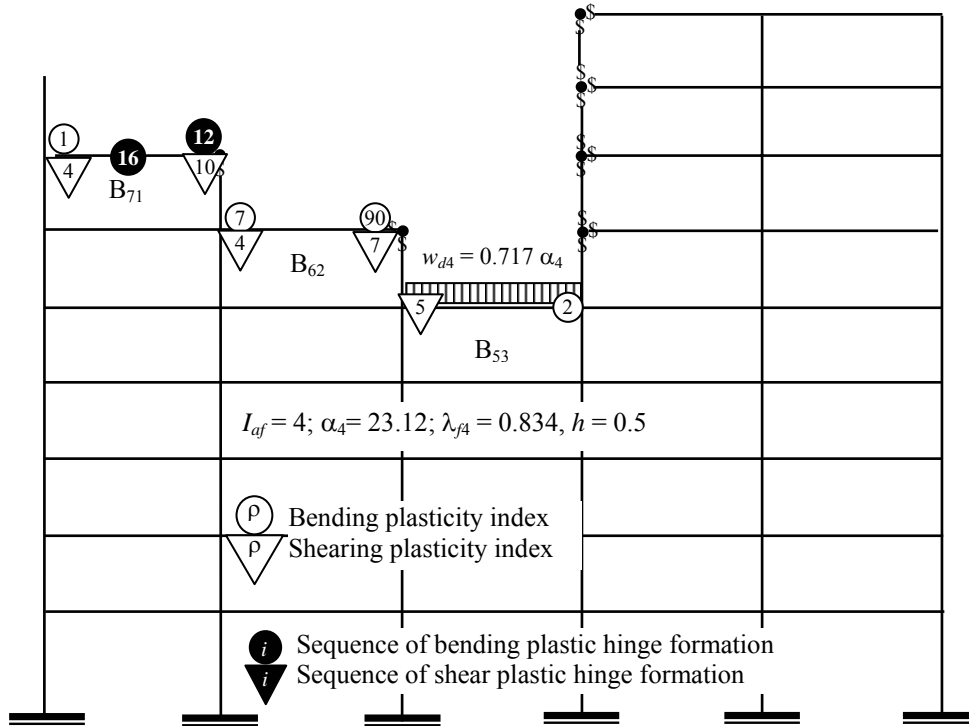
Example 5 (Boston): Beam B_{63} falls as debris loading and local instability occurs (Stage 4)
